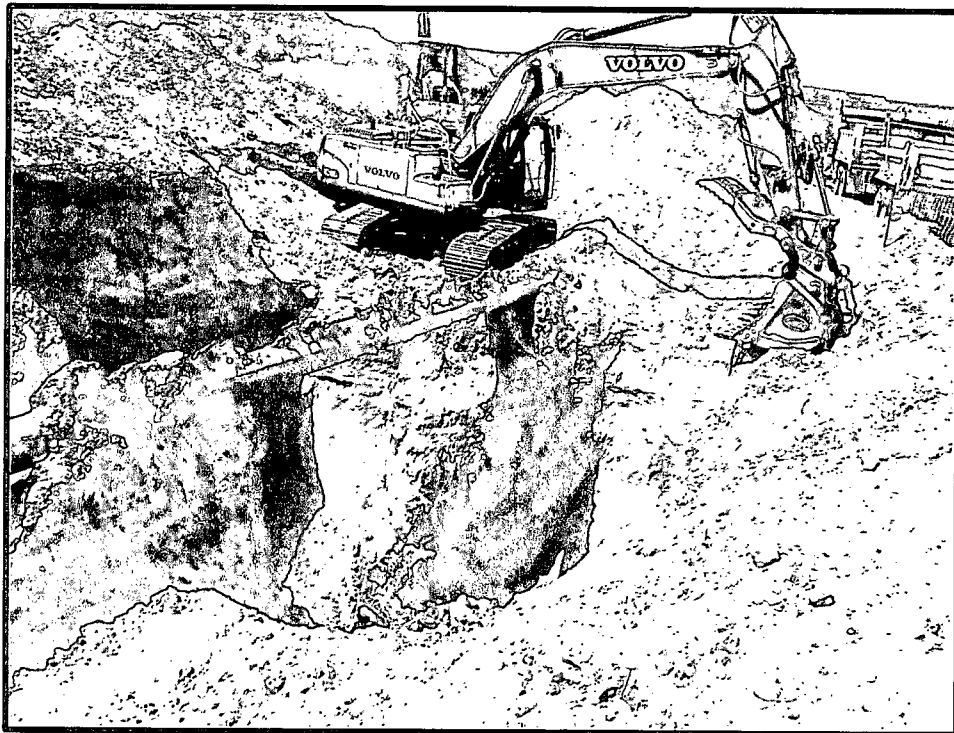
Near complete excavation of the Trunk K #1 pipeline release with a maximum depth of 24'.
